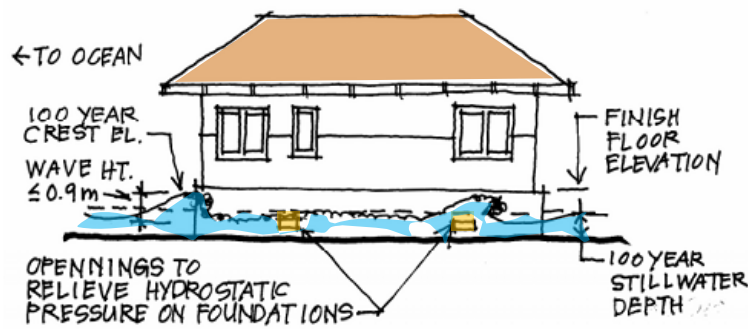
Construction/design measures for zone c- elevating structure above base flood level & create openings in plinth level (Source: AIA report, 2006 / Author,2015)
